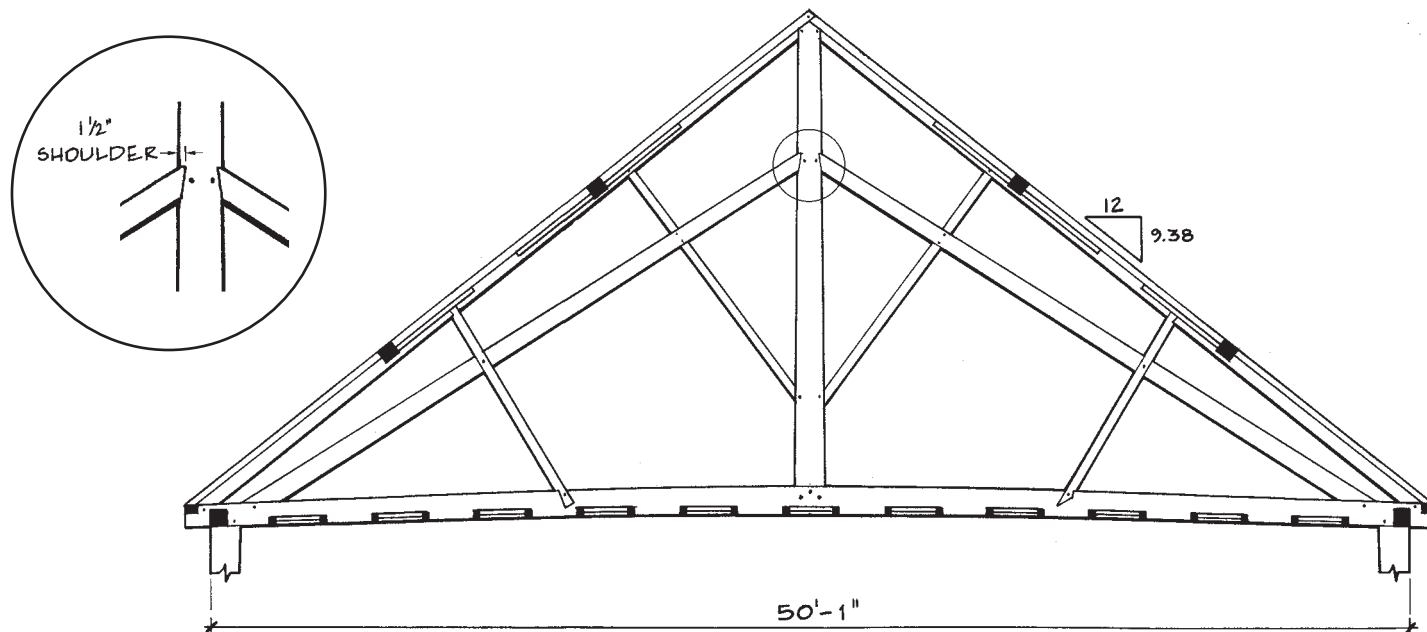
STRAFFORD, VERMONT, MEETINGHOUSE, 1799, WITH DETAIL OF UPPER CHORD ABUTMENTS.
